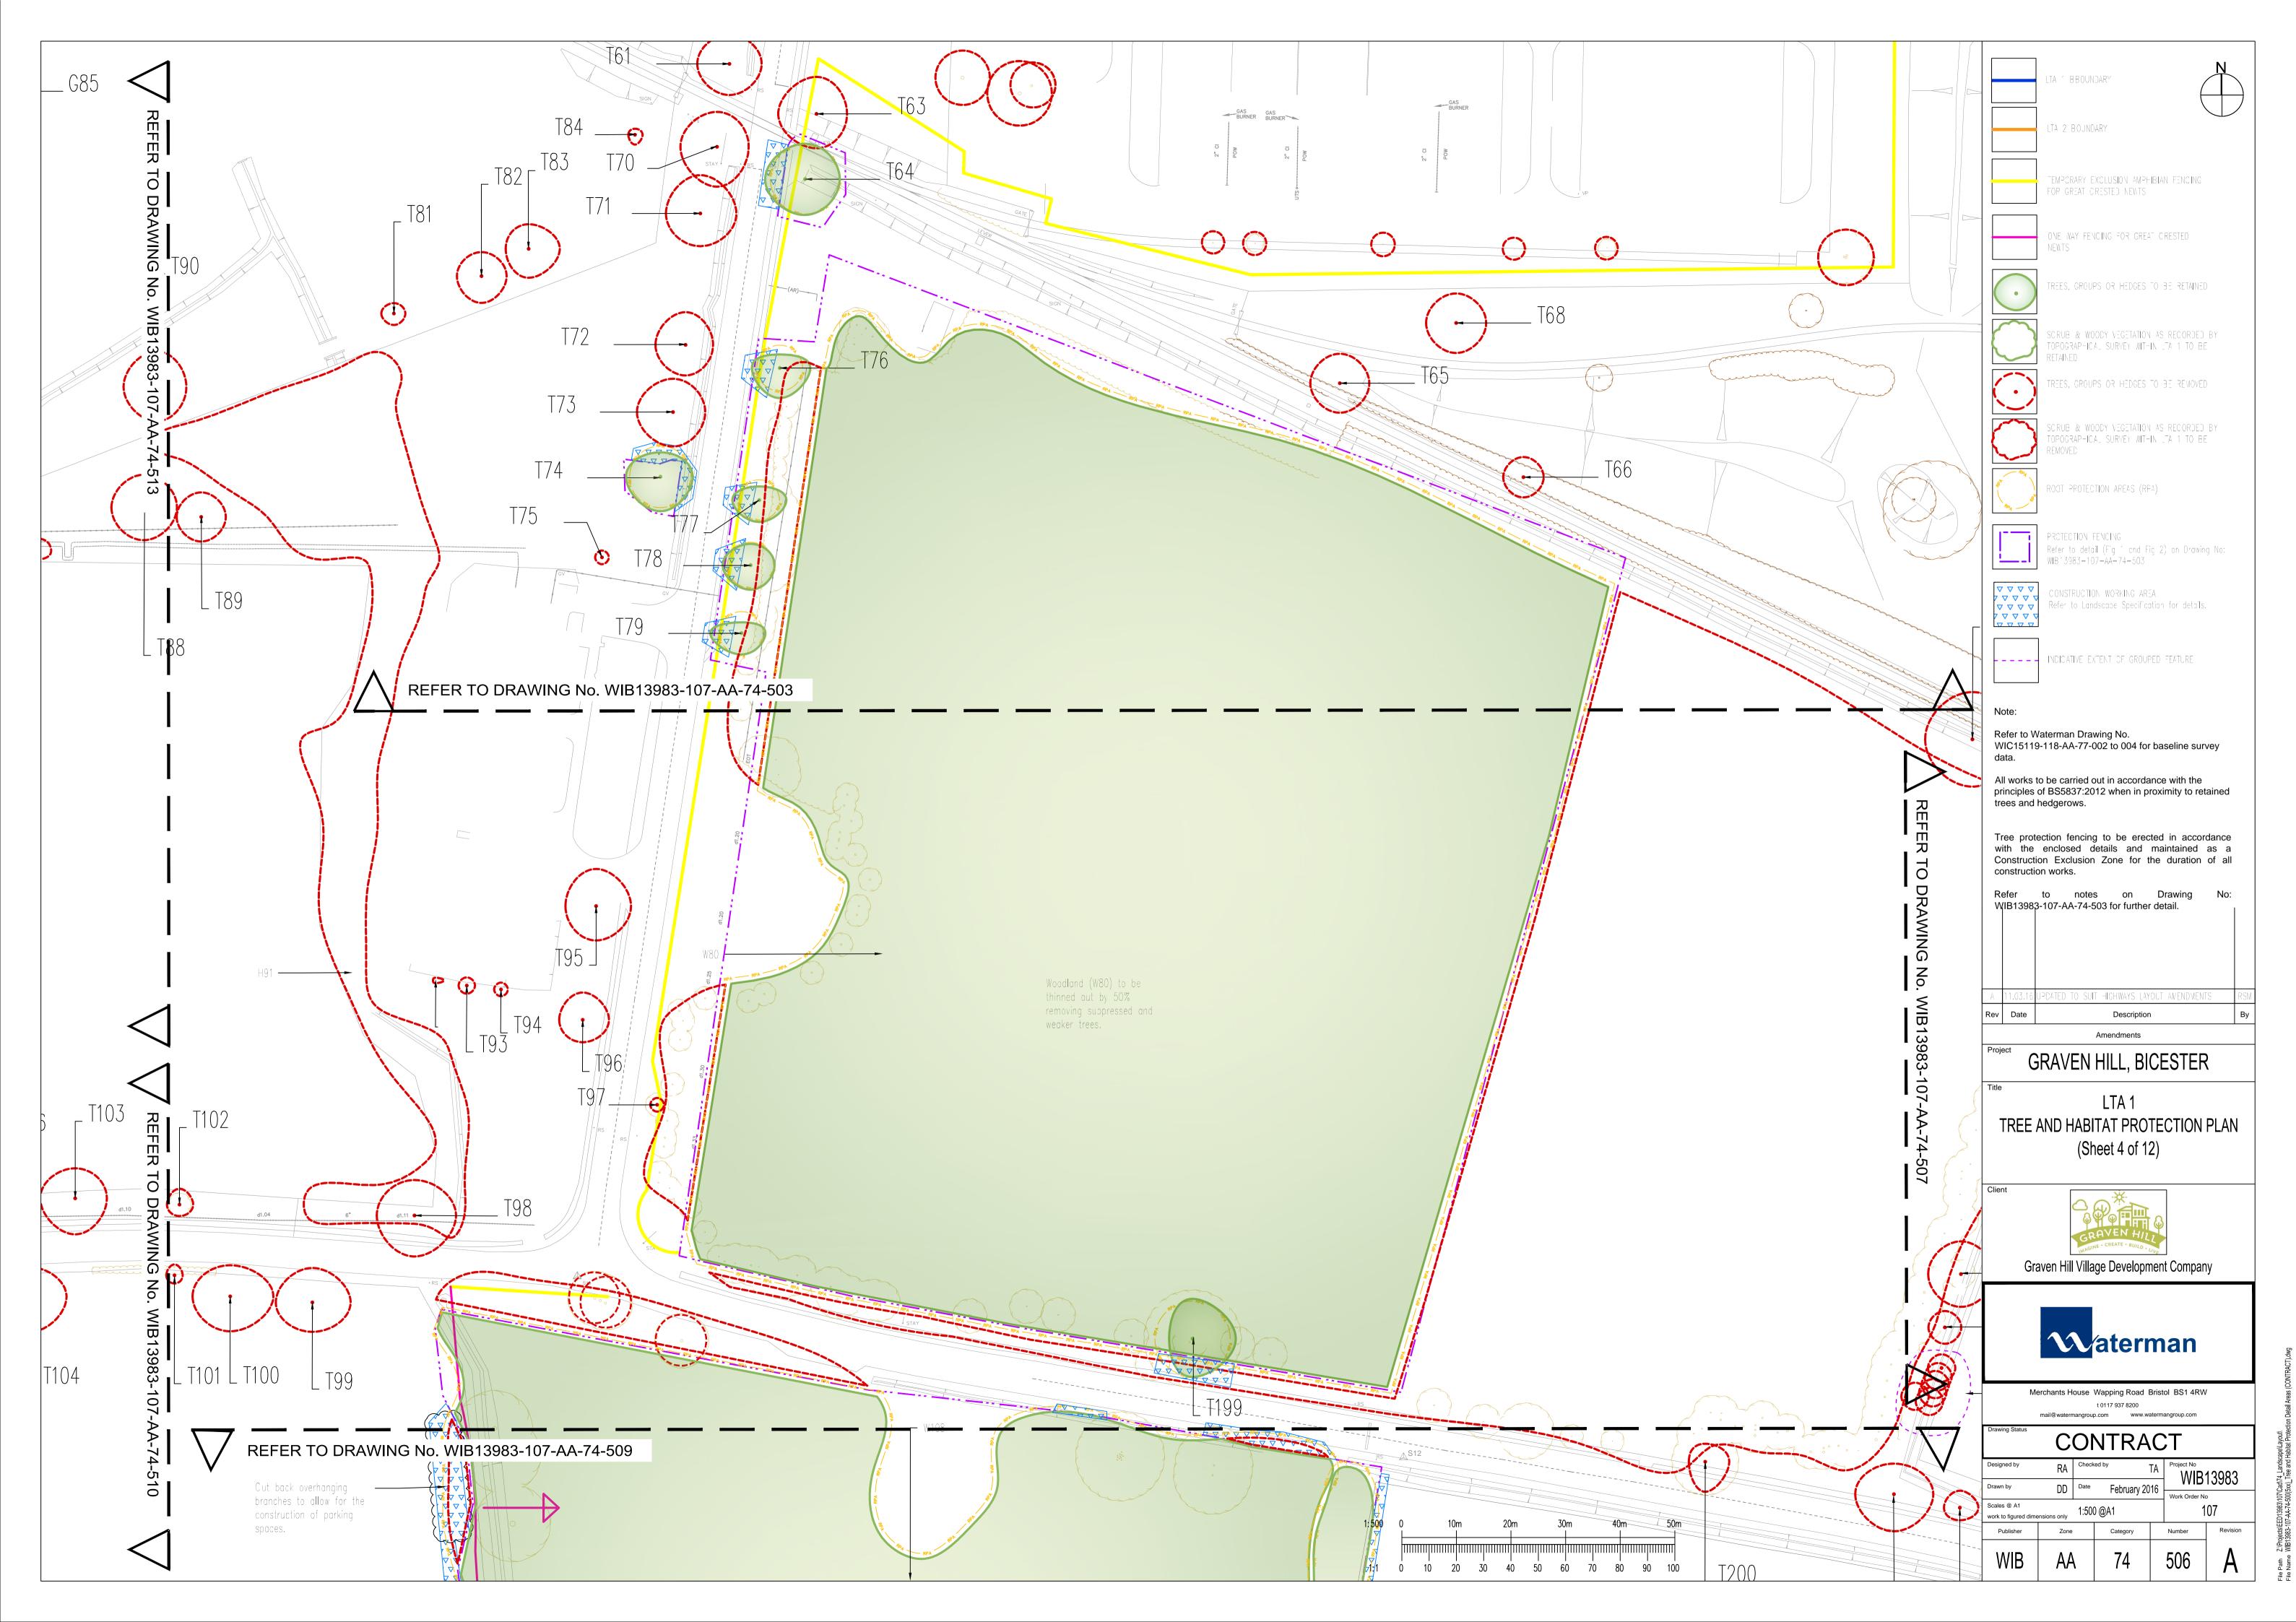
LTA 1 Tree and Habitat Protection Plan Sheets 1 of 12, Waterman Drawings WIB13983-107-AA-74-503 to -514
